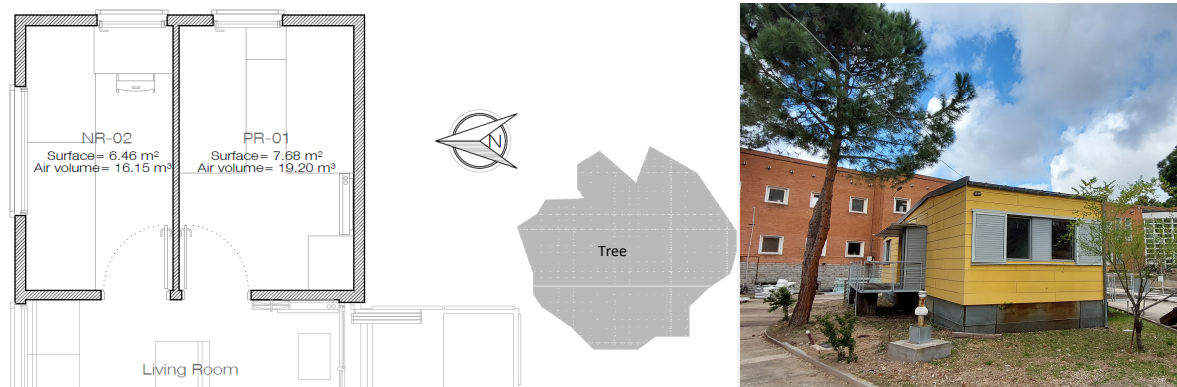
Architectural plan and photograph of the east façade of the selected rooms
